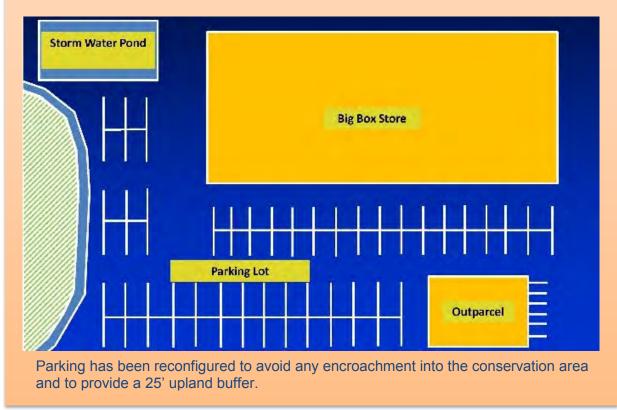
Example of a commercial site plan revision to avoid impacts to the wetland and upland buffer.
